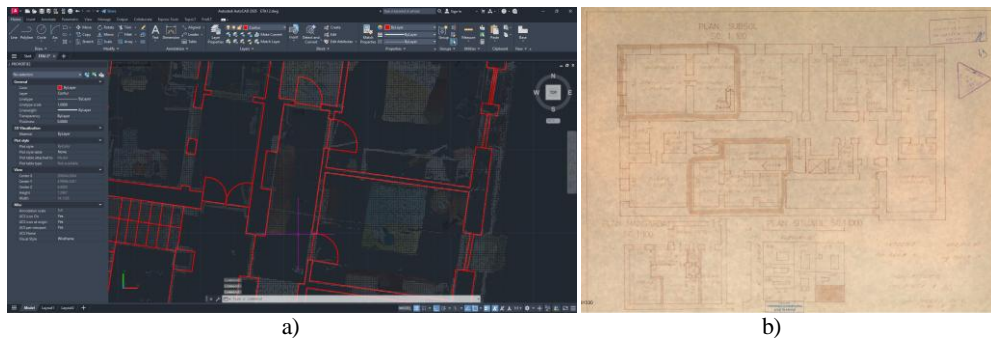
a) Floor plan based on AutoCAD point cloud; b) Floor plan from the records of O.C.P.I. Timiș
